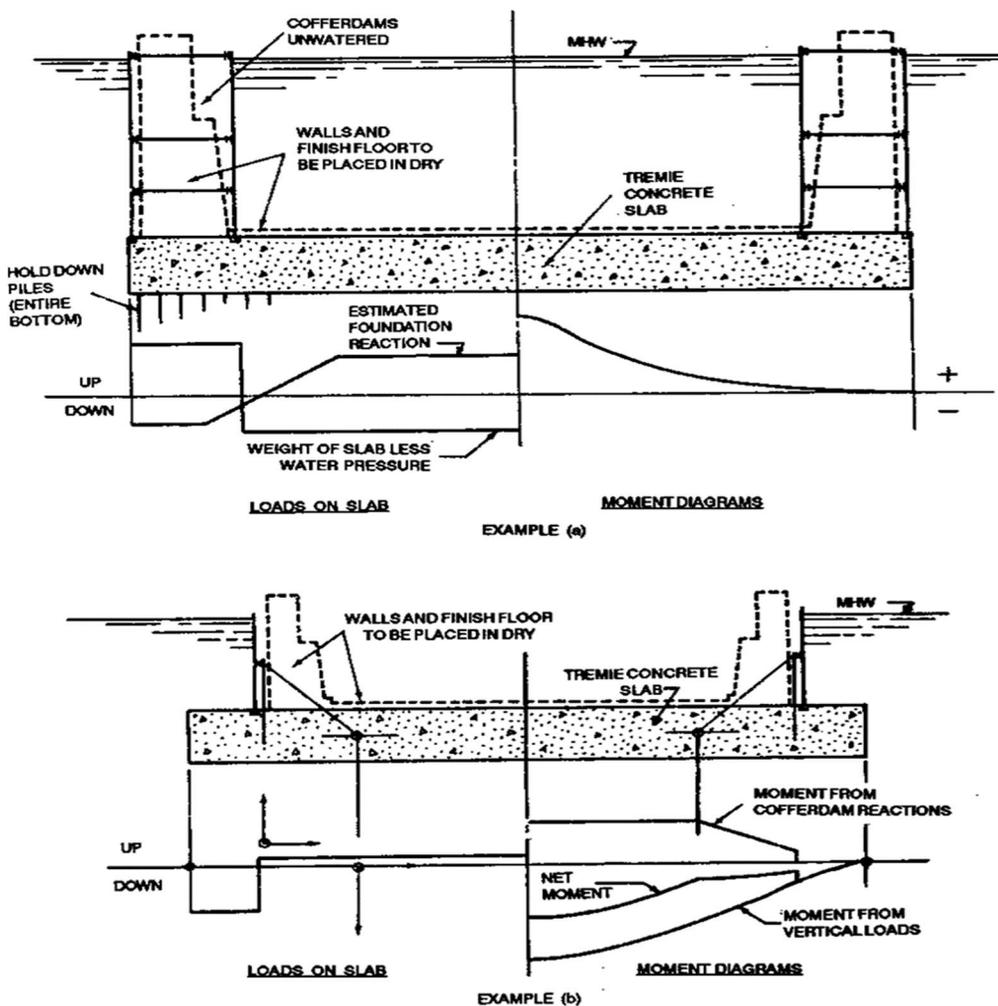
Examples of Drydocks with Slabs Constructed Underwater and Walls and Finish Floor Constructed in Dry
